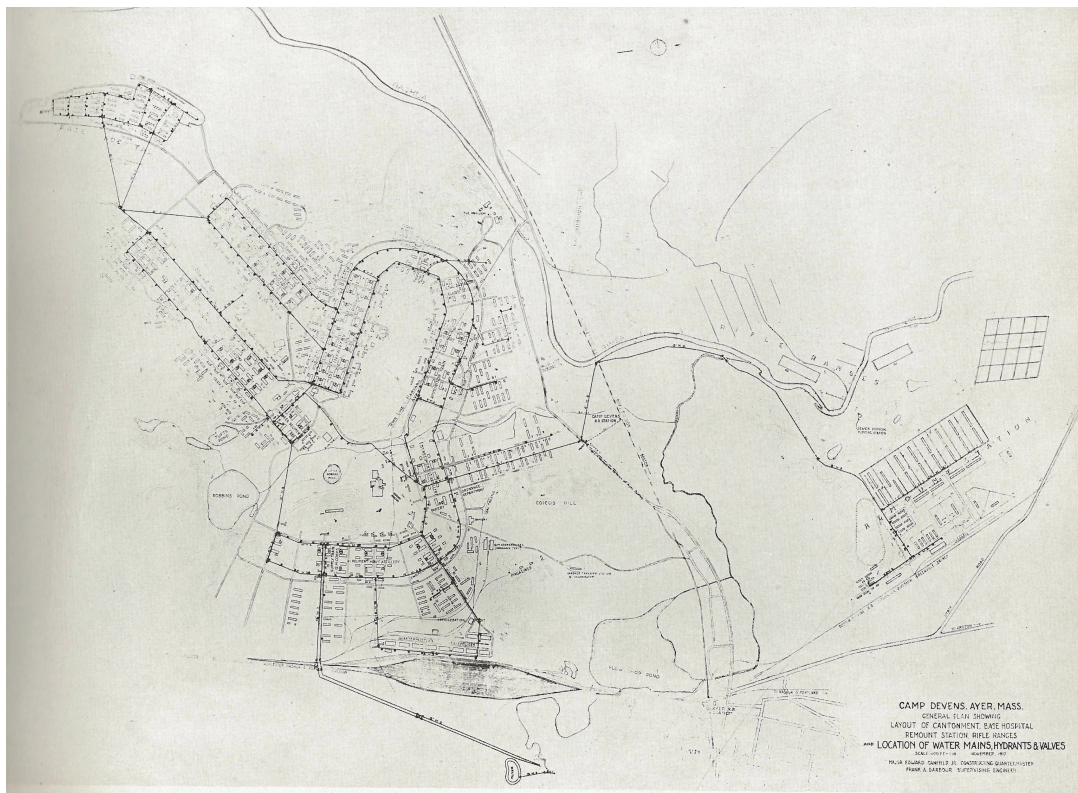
Herbert J. Kellaway, Plan of Camp Devens. Published in *National Army Cantonments: Plans and Photographs*, June 1918 (War Department, Construction Division, 1918).
